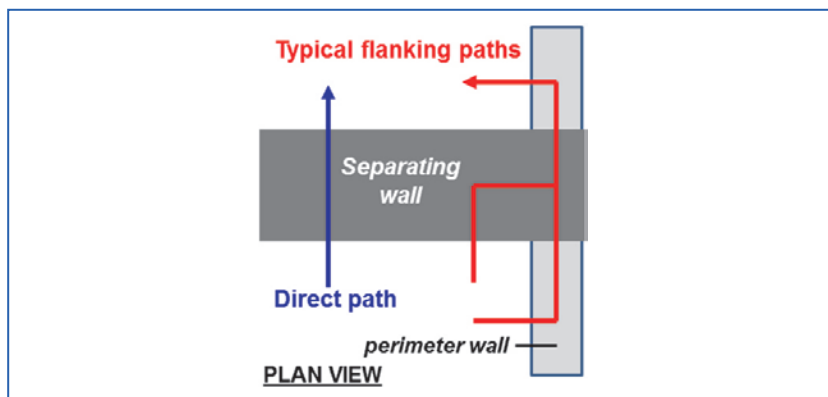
Example of 'direct' and 'flanking' transmission pathways for a separating wall.
